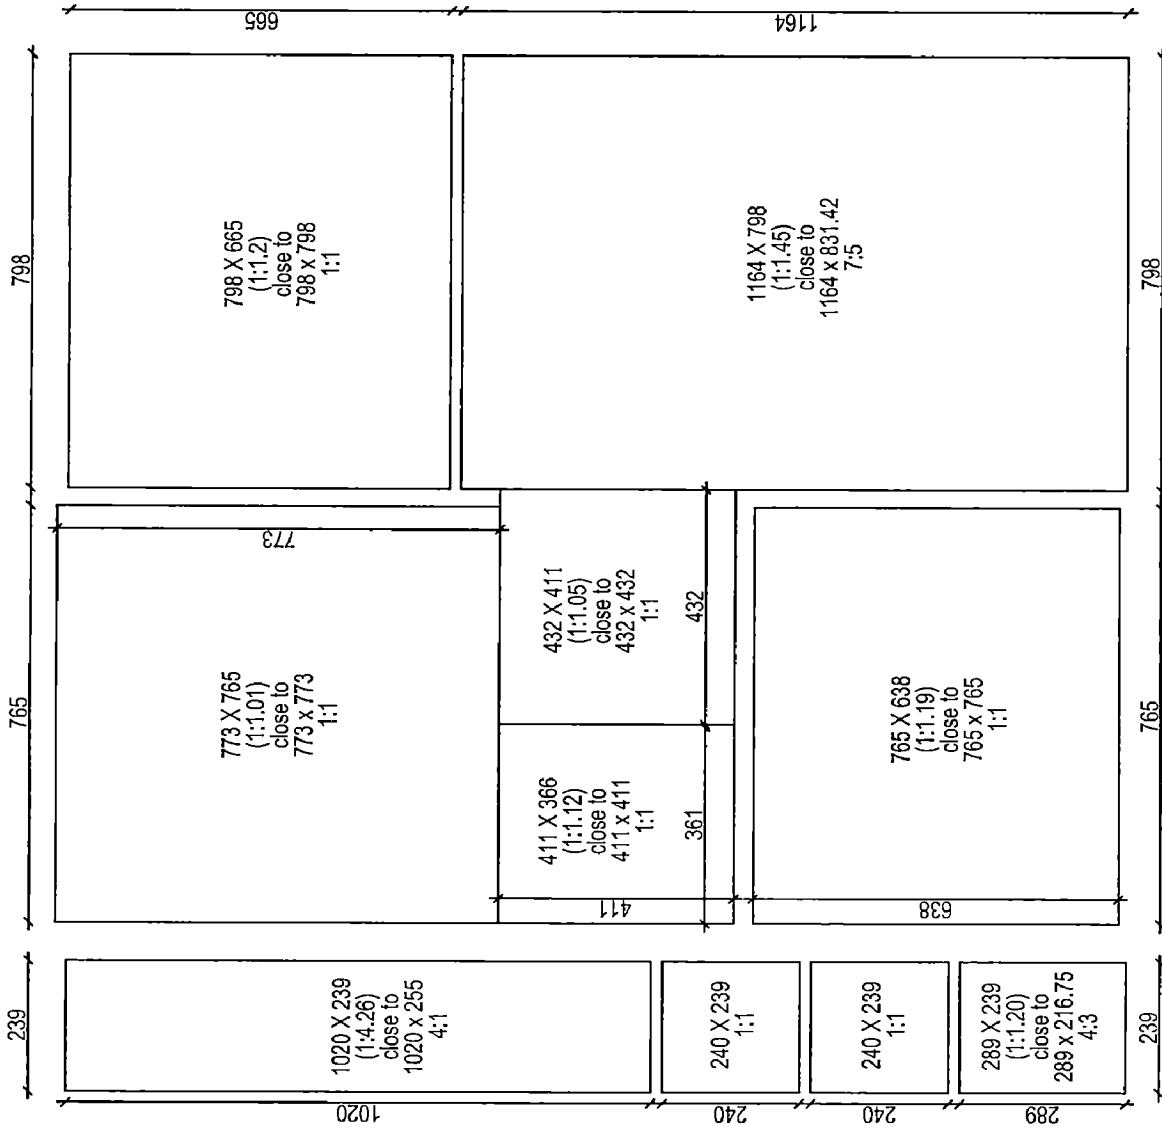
Shodhan Villa, Second Floor Plan Of Schematic Analysis
